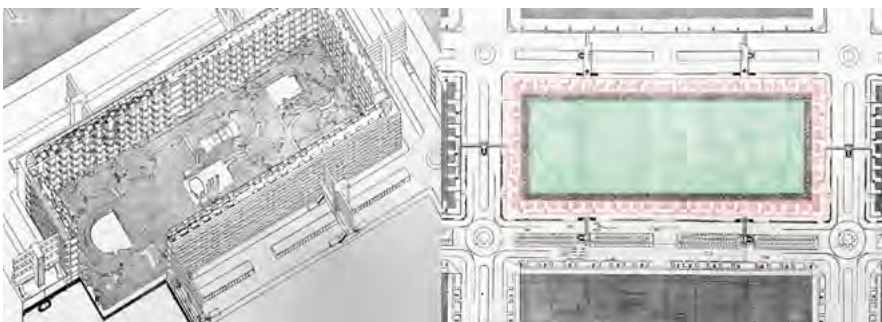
Axonometric drawing (left) and First floor plan of Immeubles-Villa(right)
